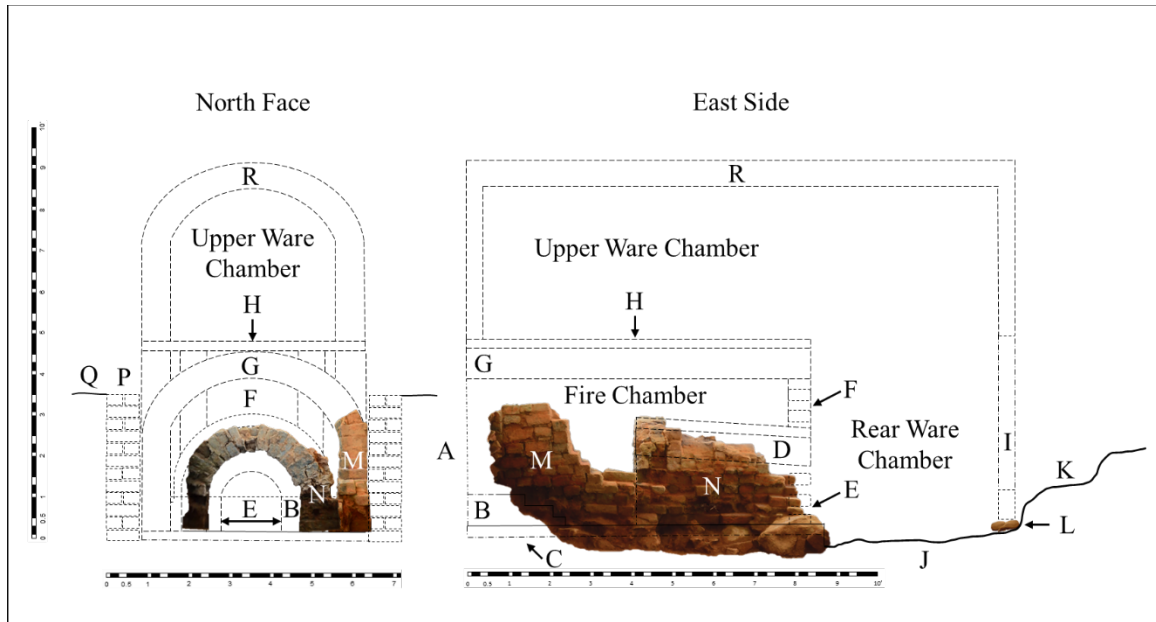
Second hypothesized 1811 kiln design using 3D photogrammetry of existing ruin and conjecture. Showing: A) fire chamber opening; B) step down into fire chamber; C) brick floor; D) vault of interior tunnel; E) bag wall; F) additional support for roof of fire chamber (perhaps a continuation of the bag wall); G) vault of exterior tunnel; H) stone floor of upper ware chamber; I) temporary entrance for ware chamber; J) floor of ware chamber; K) step cut into subsoil; L) builders' trench foundation stones in situ; M) intact portion of outer fire chamber tunnel; N) intact portion of interior fire chamber tunnel; O) rear opening of interior fire chamber tunnel; P) conjectural brick support walls between fire chamber and subsoil; Q) original ground surface; R) roof of ware chamber with one or more vent holes or small chimney.
